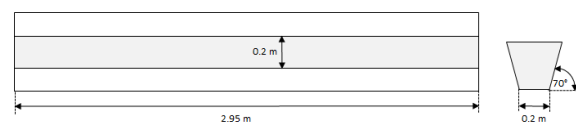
Plan View and the Side Elevation of the Prismatic Channel
